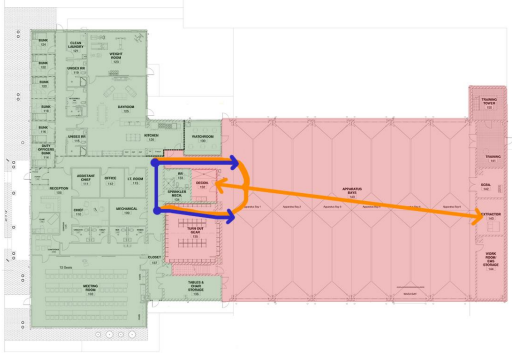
Diagram Over Lafayette Township Fire Station Floor Plan <sup>59</sup>
